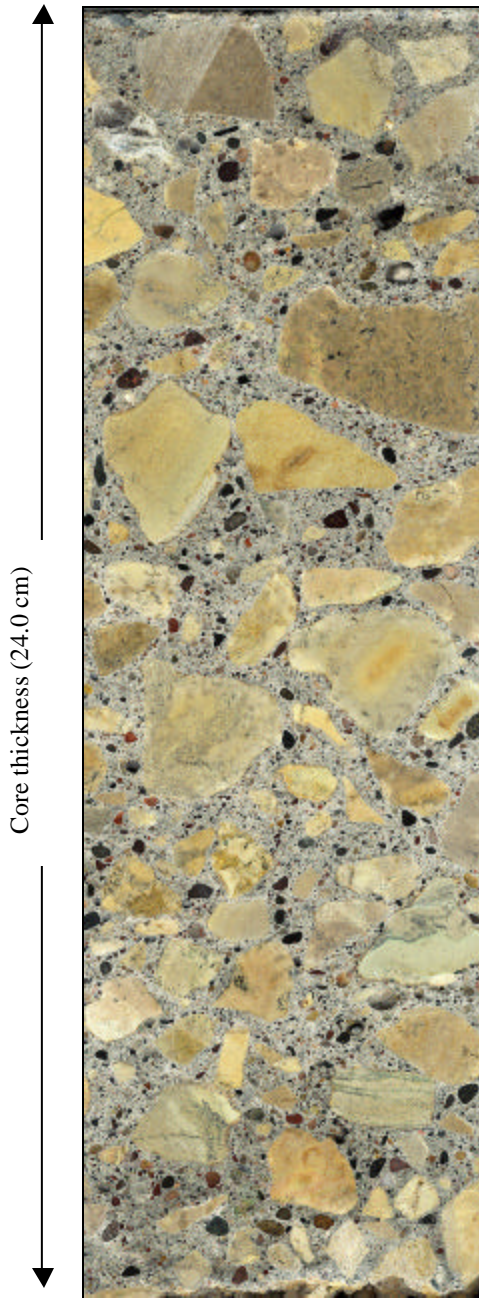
Polished cross-section of pavement section 27-4054.
